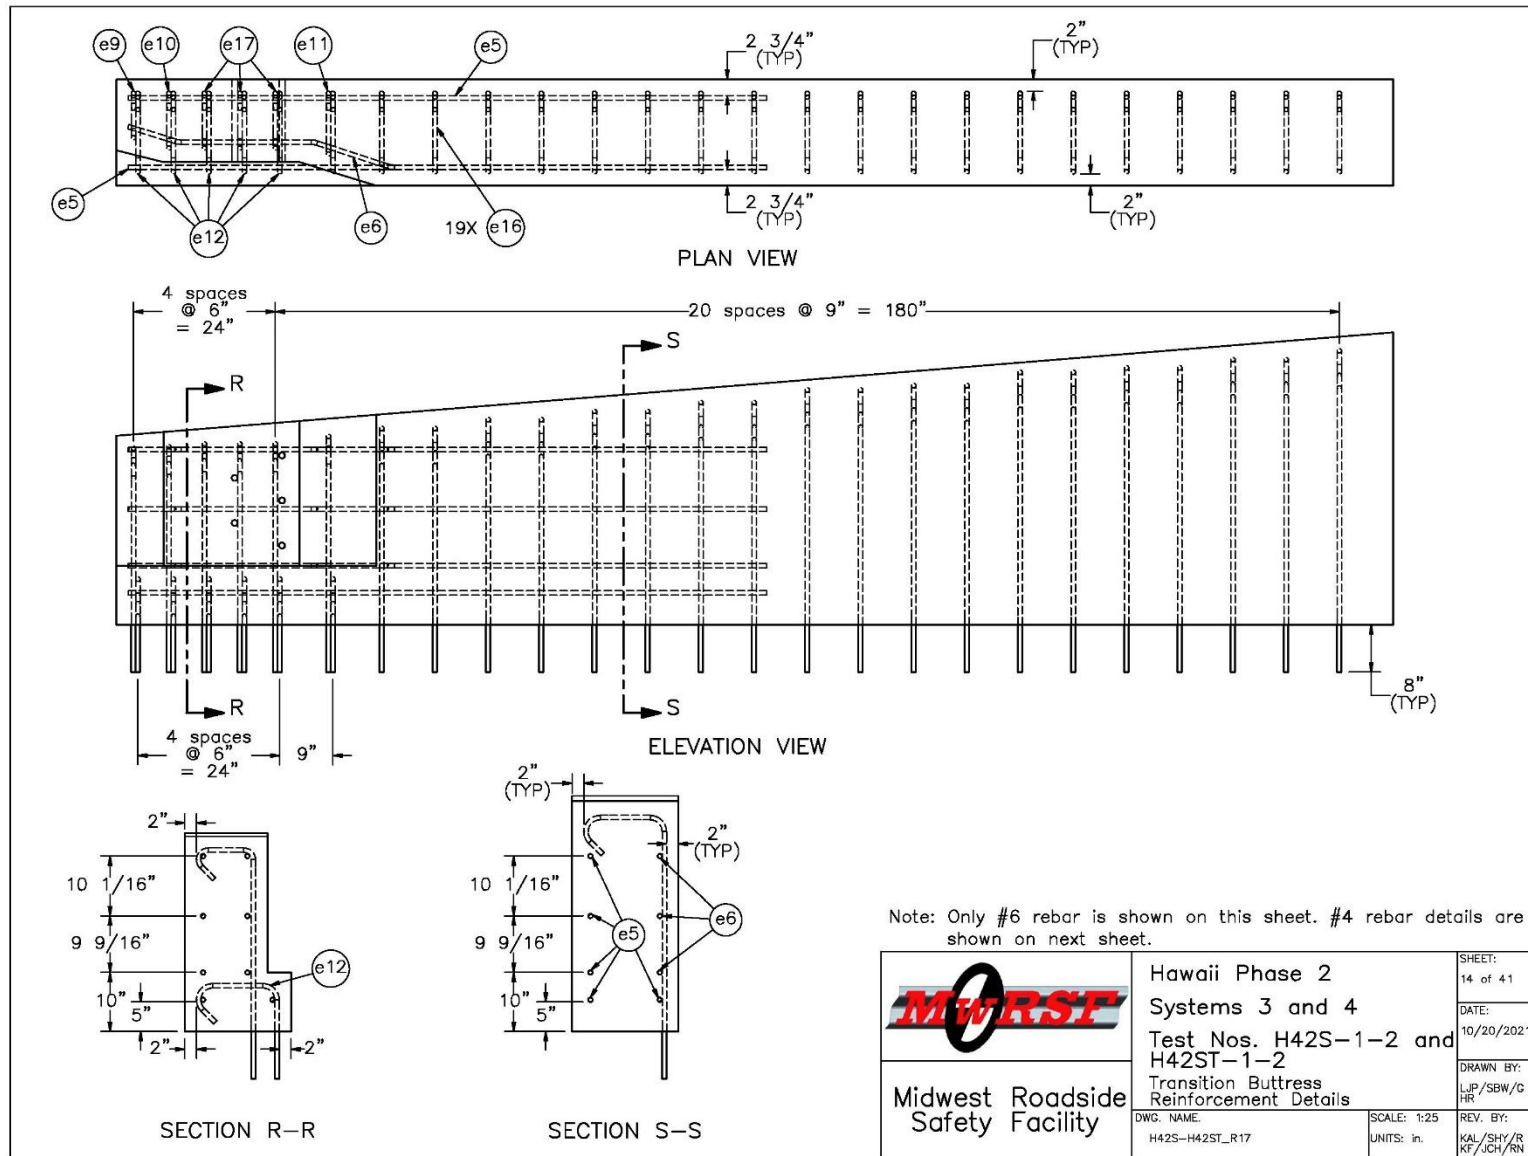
Transition Buttress Reinforcement Details, Test Nos. H42S-1 and H42S-2
